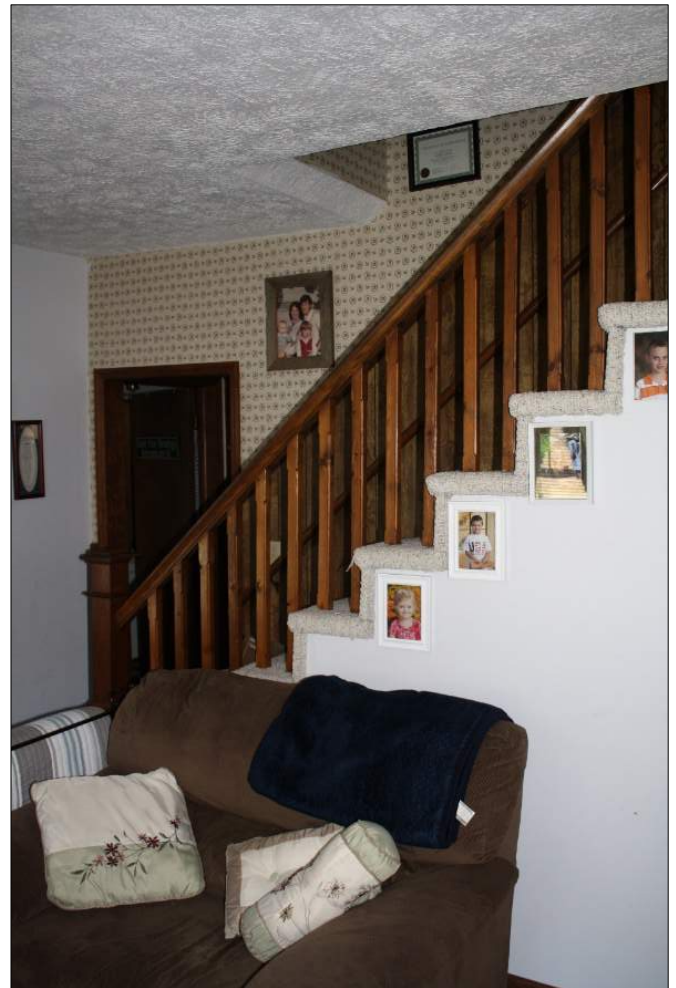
Exposed interior stairs (replacement) in first-floor west room
